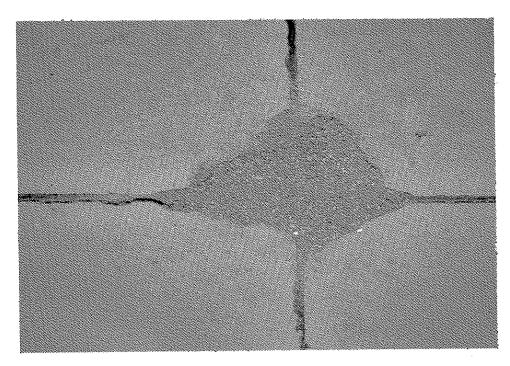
Bituminous Patching of Spalling at the Joint Intersections
